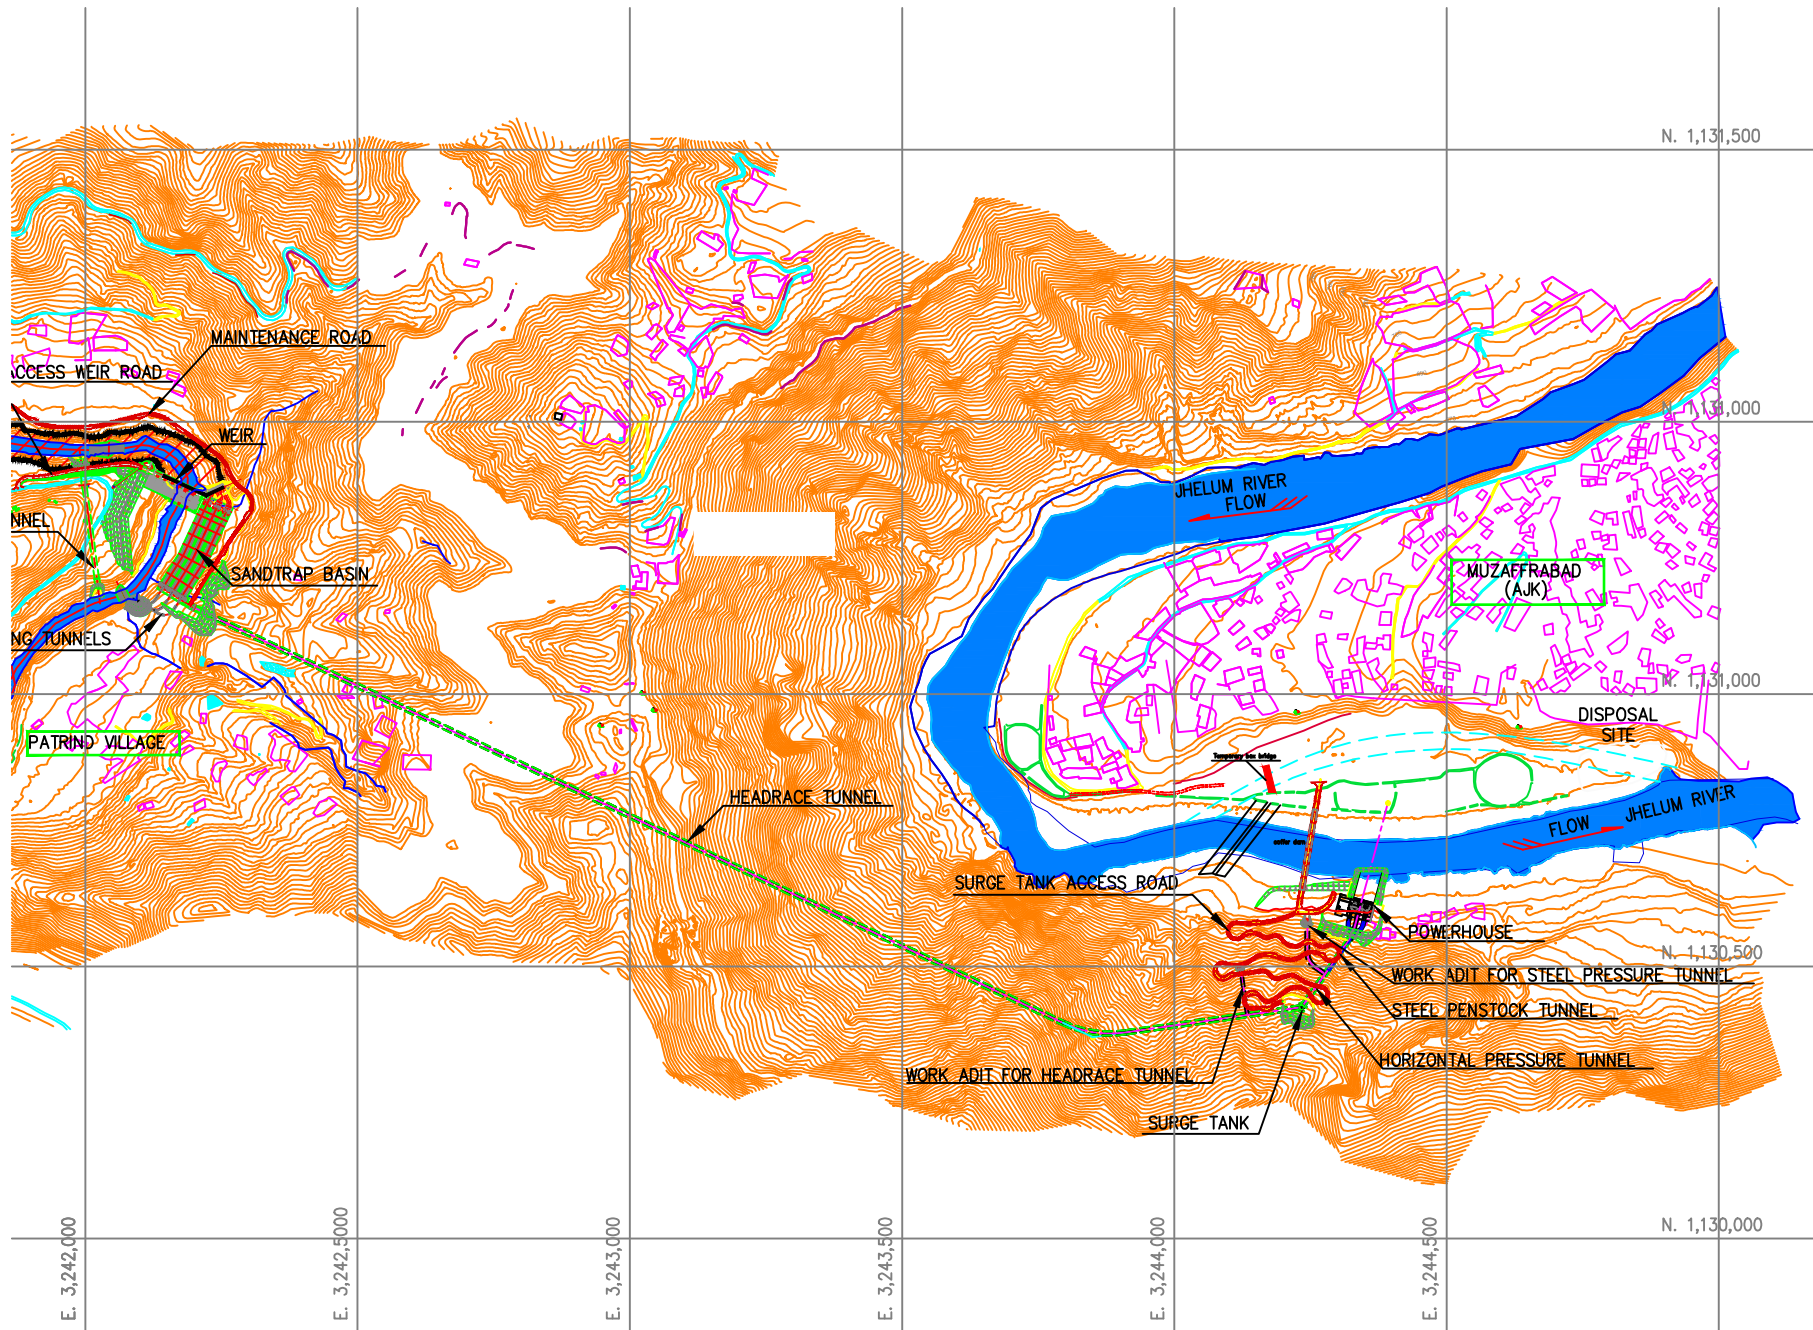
Sites for Disposal of Excavated Material near Power House Site
